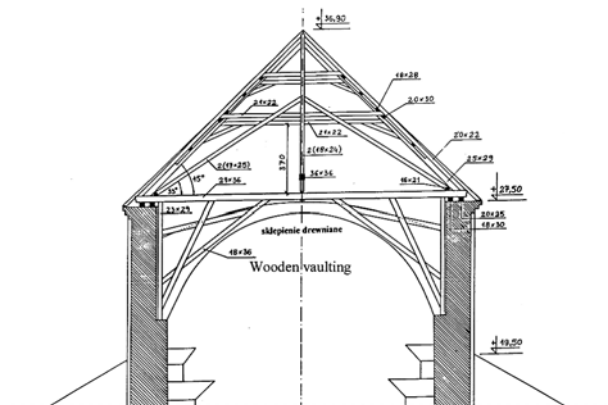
Fragment of reconstructed attic floor (St. Joseph Church in Kicin)
